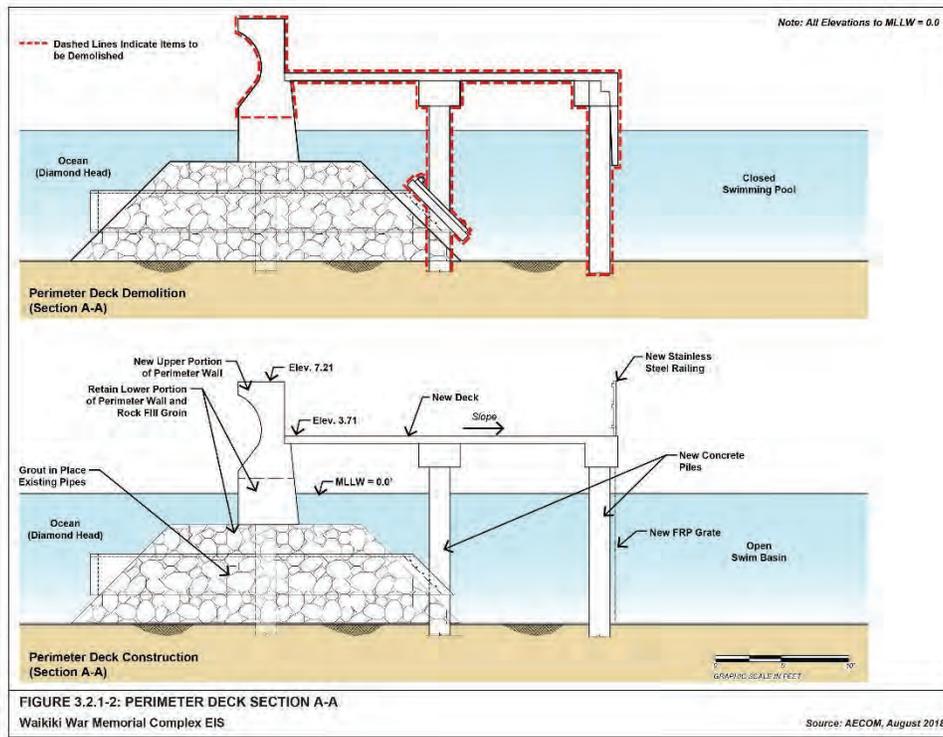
Alternative 1 – Perimeter Deck, section view A-A.
